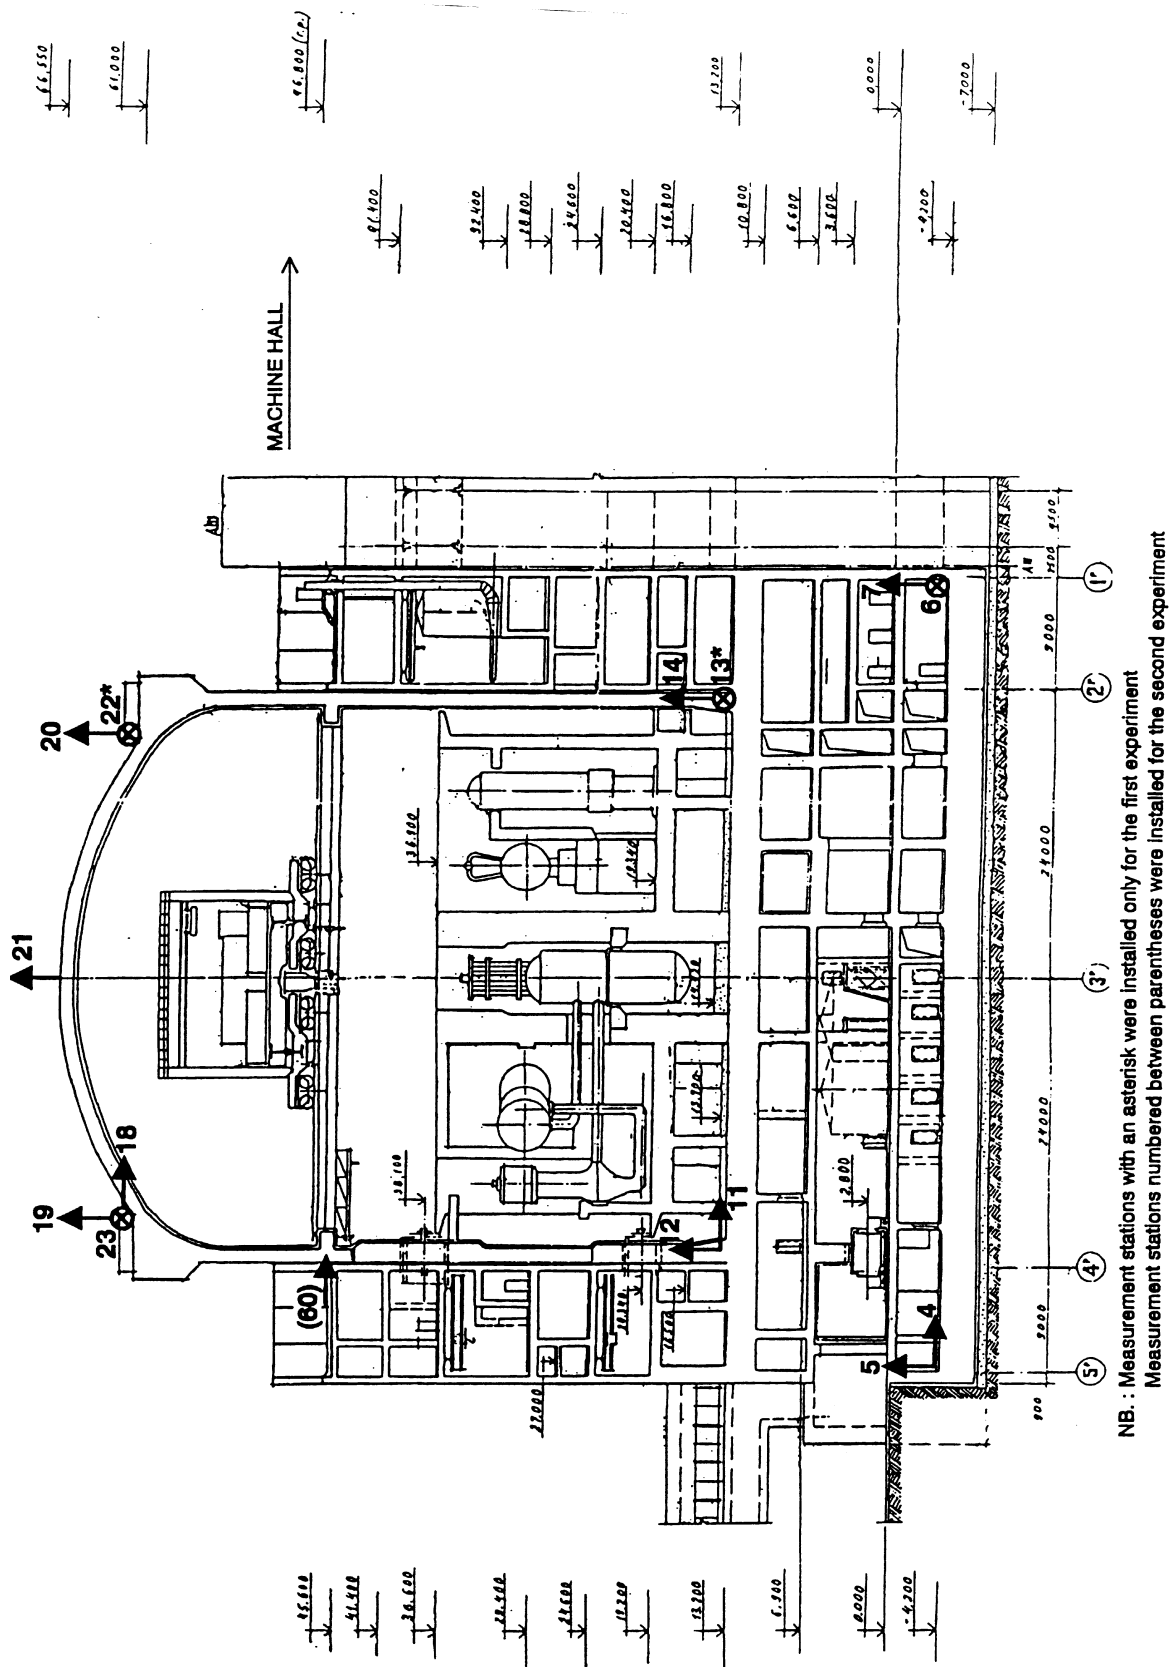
Dynamic testing of Kozloduy NPP Unit 5 structures — instrumentation layout in the reactor building — longitudinal cross-section view.
